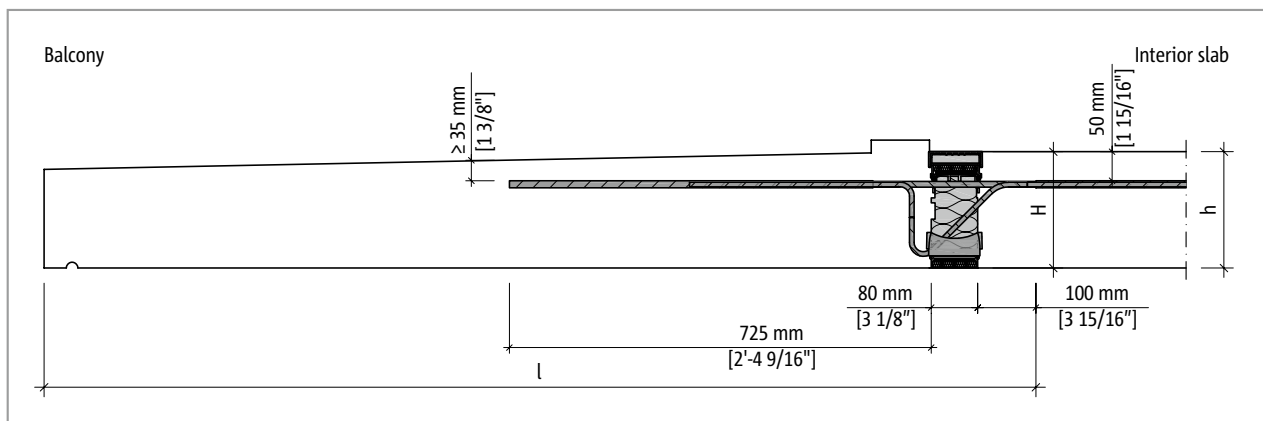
Schöck Isokorb® T Type CK: Concrete cover CV50 [2"] with sloped balcony slab
